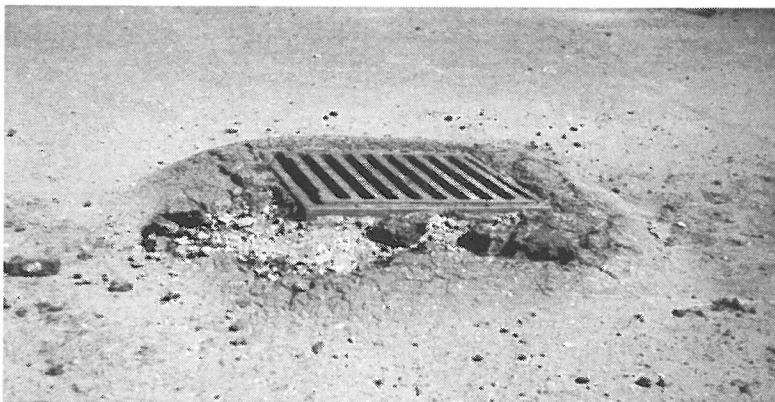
Stormwater inlet damaged by frost heave.
